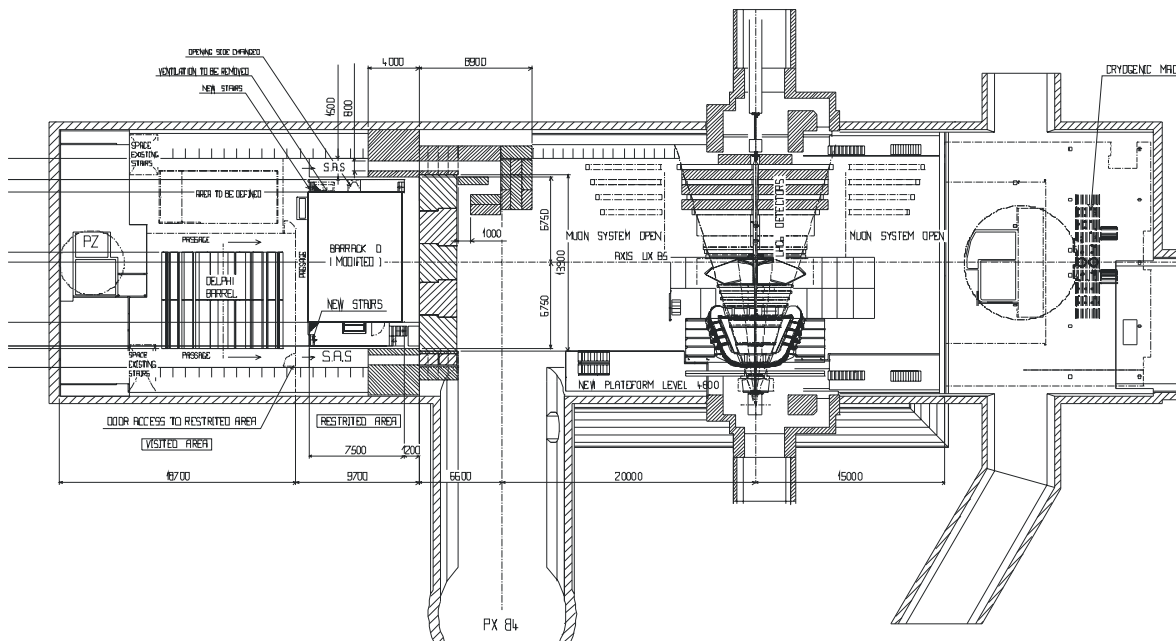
Detailed View of the Underground Installations in UX85C (left of the wall) and UX85D (right of the wall).
